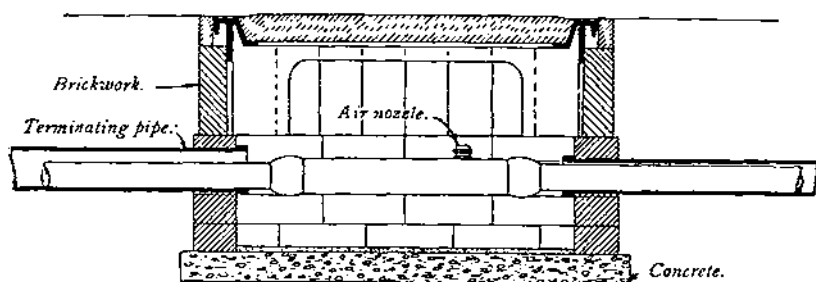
Extra large Joint Box with Terminating Pipe.
